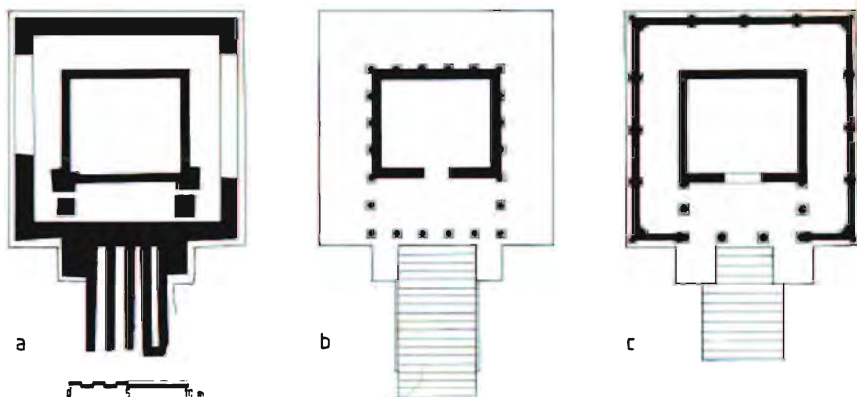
The temple at 'La Grange-des-Dîmes', Avenches: a, excavated plan (after Verzár 1978, Fig. 1), b, reconstructed plan after Verzár (1978, Fig. 6); c, alternative reconstruction.
